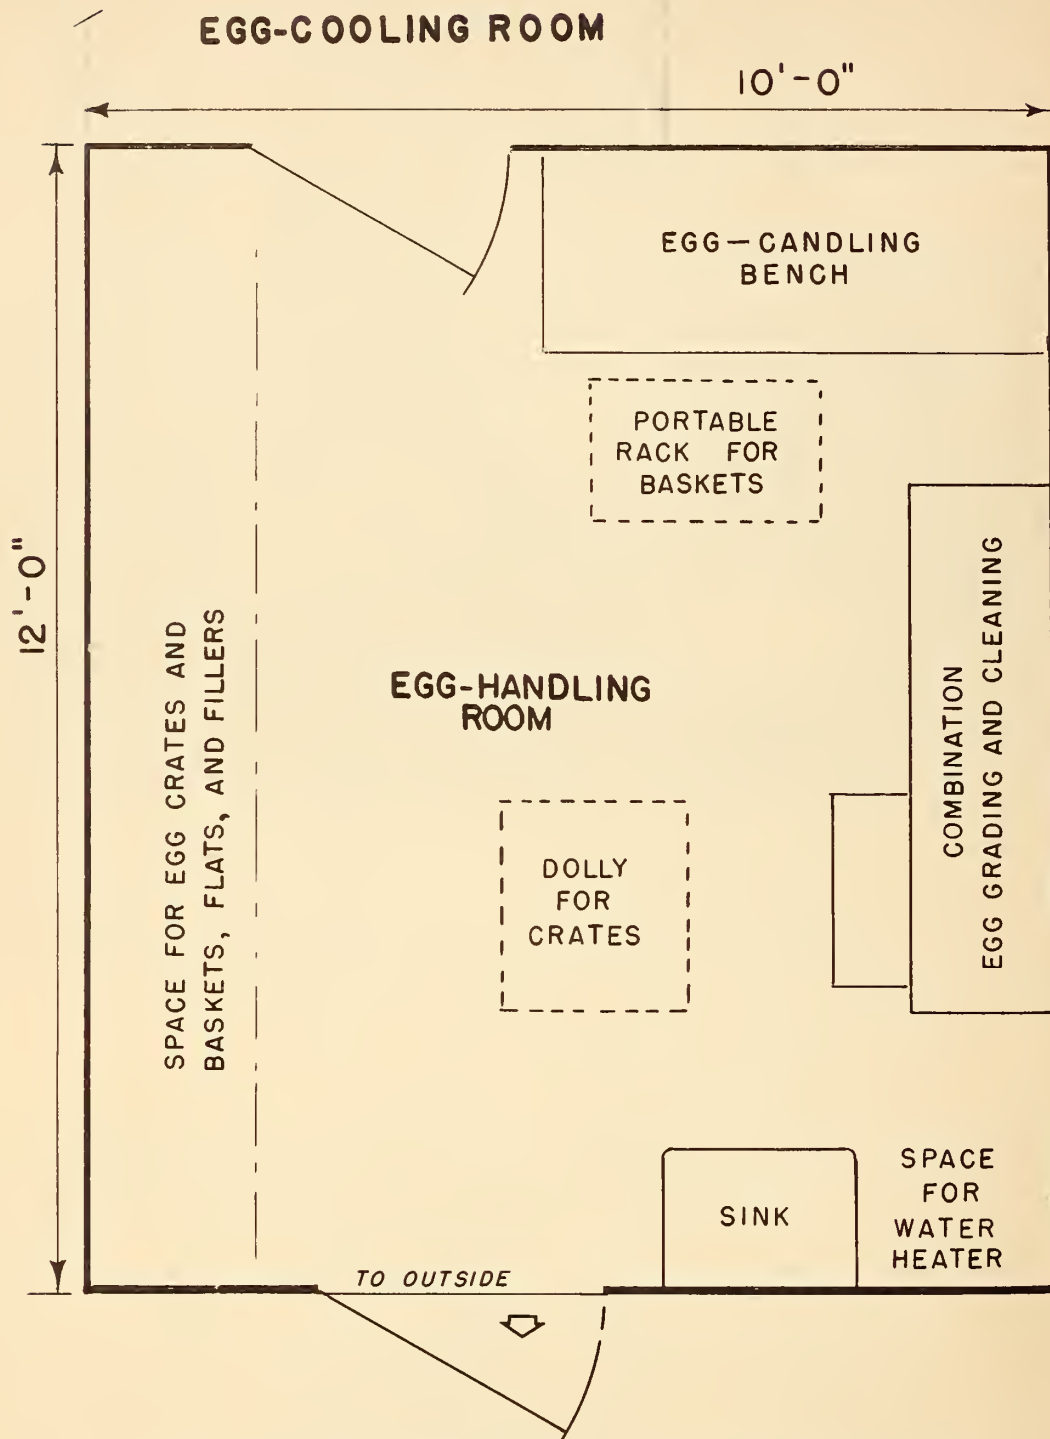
Typical floor plan for egg-handling room for a flock of 1,000 or 5,000 hens.
